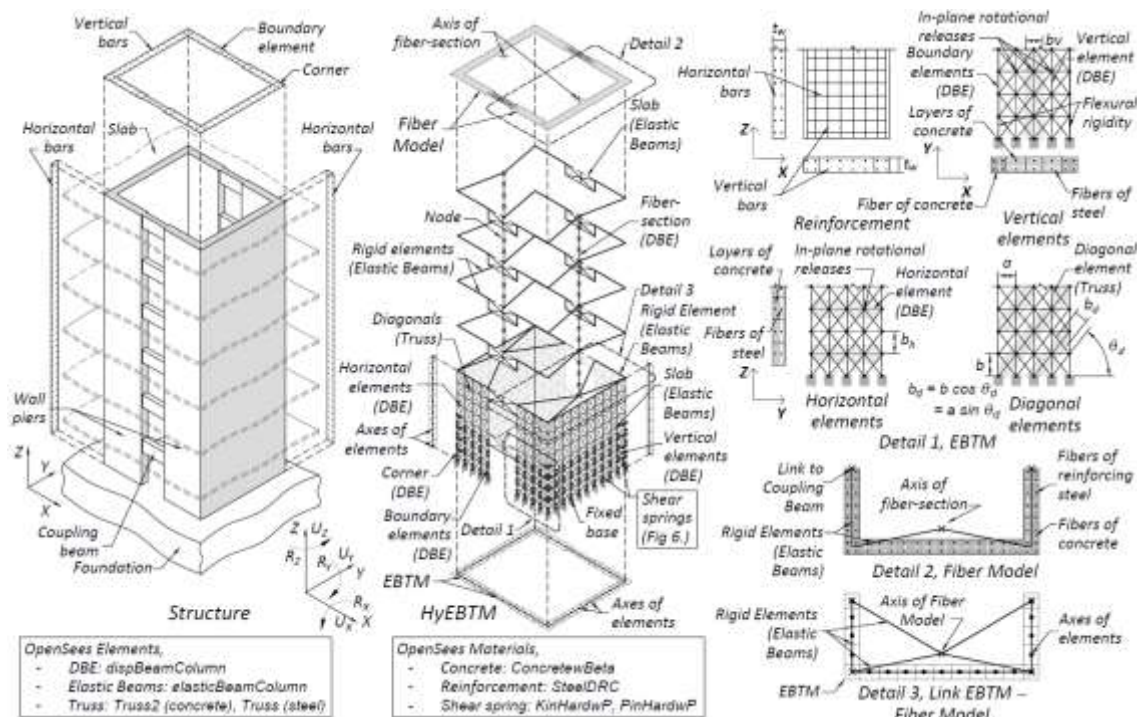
Description of the Hybrid Fiber-Section – Enhanced Beam-Truss Model.
